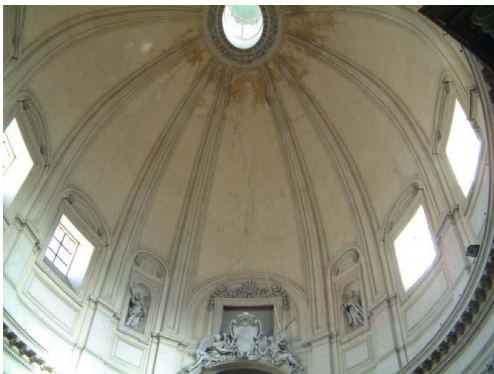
Cracking in masonry do not necessarily point to structural problems.
